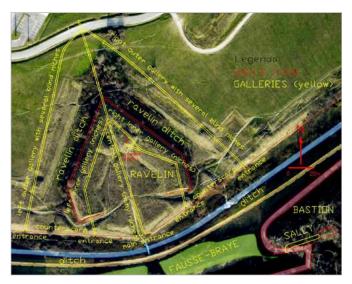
plan of the system 2r1 superimposed on the orthophoto. Fig.4: pianta del sistema 2r1 sovrapposta all'ortofoto.
